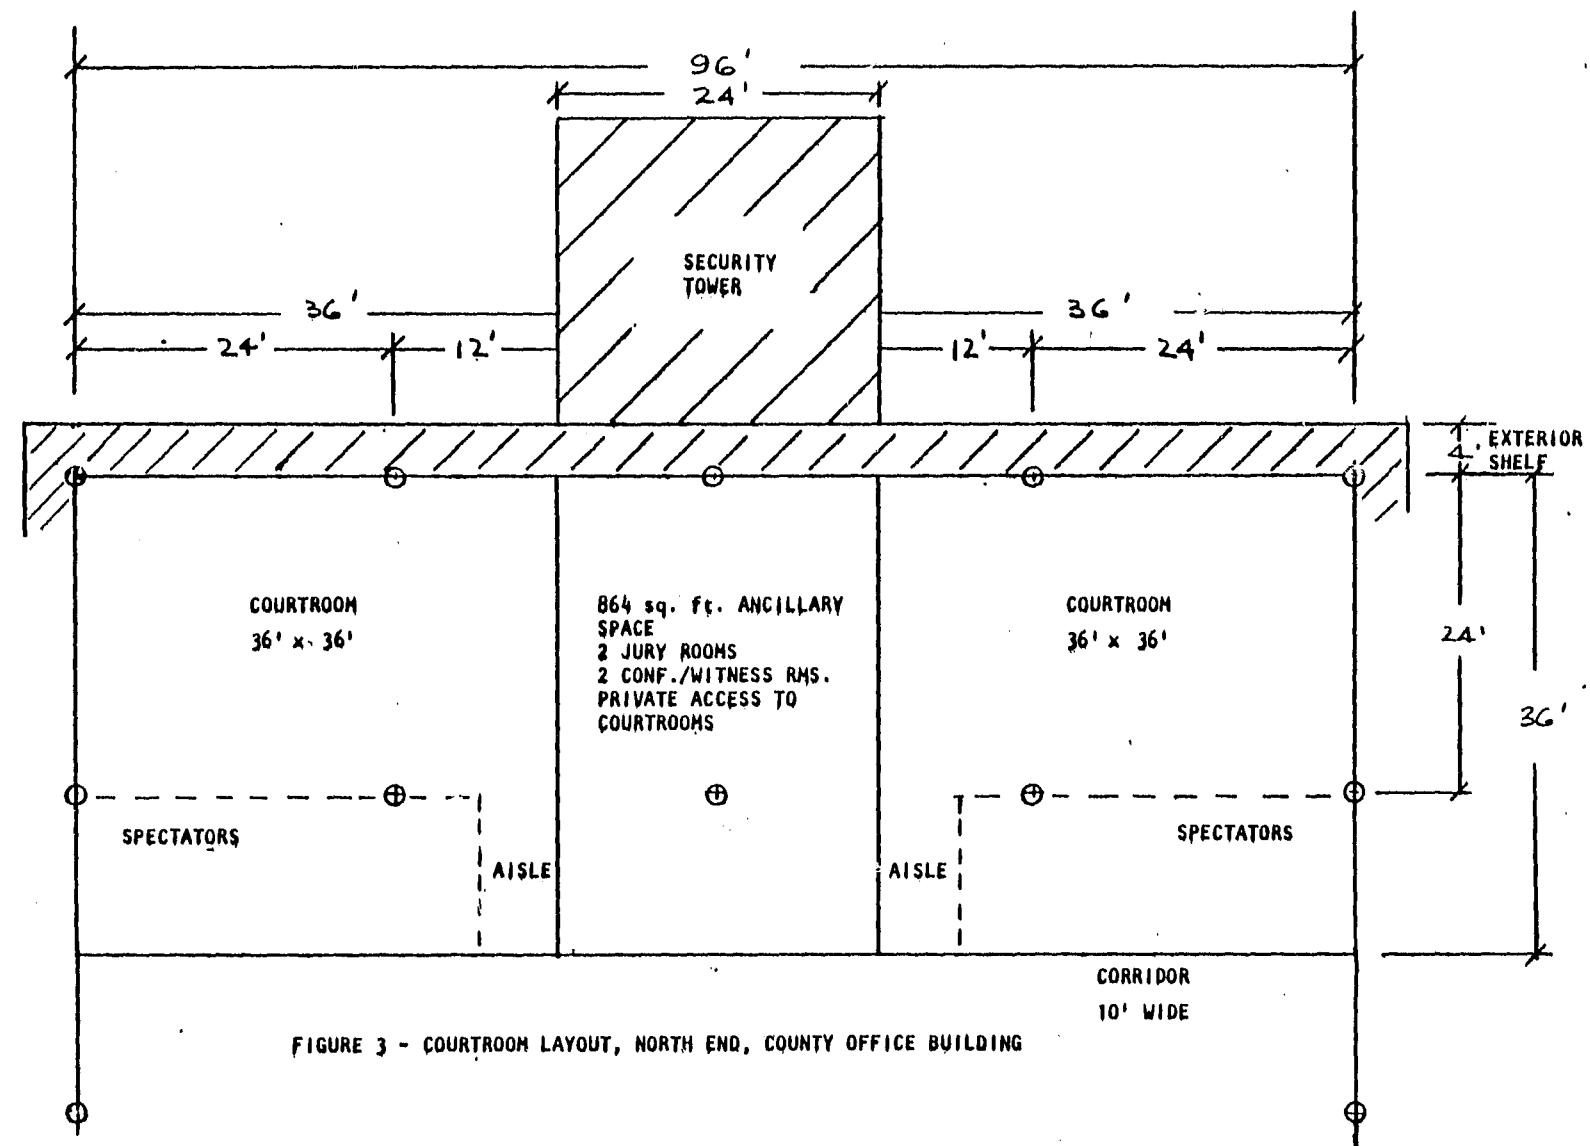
COURTROOM LAYOUT, NORTH END, COUNTY OFFICE BUILDING
